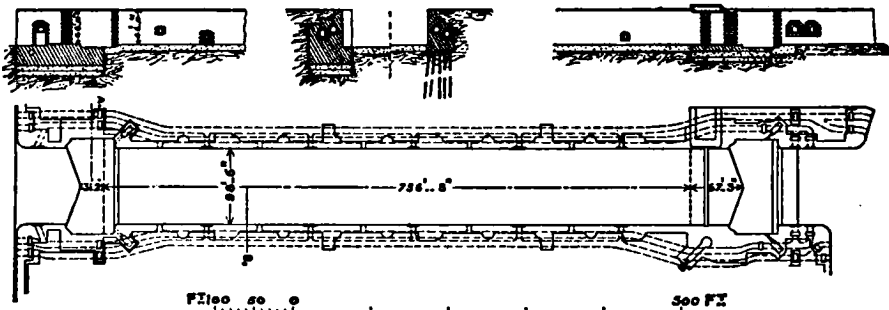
Florida Lock, Havre Docks, Sections and Plan.
